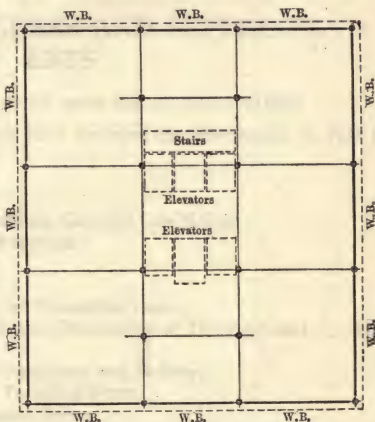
Metropolitan Tower. Plan and Lines of Bracing
